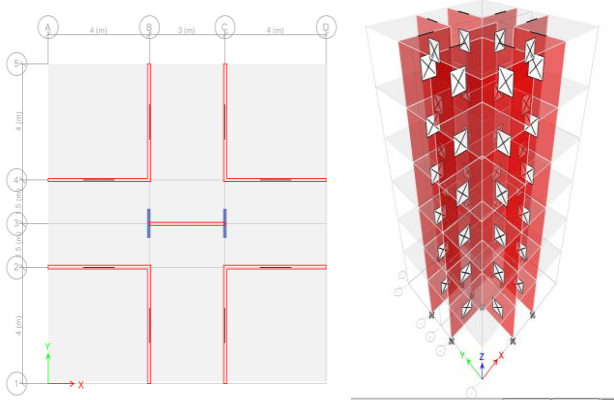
Plan and 3D view of building (6 storey 120mm) with opening
